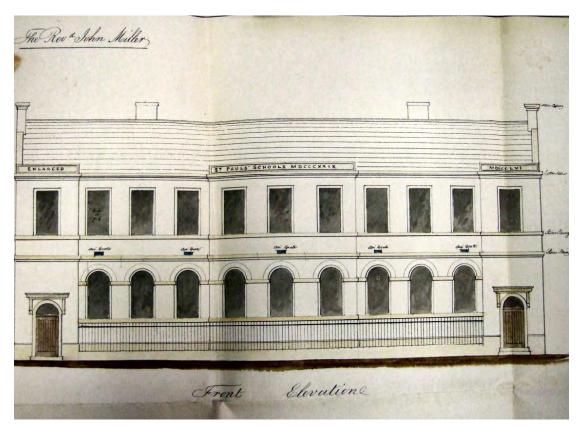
Proposed west-facing front elevation of the infants'/girls' school (Site 20) (PRO SP 246)
